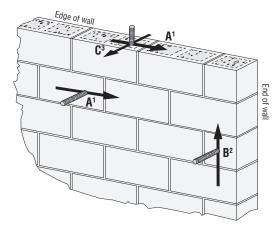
B. Allowable Anchor Locations of 7/6"-Diameter Threaded Rod and #4 and #5 Rebar for Full and Reduced Load Capacity When Installation Is in the Top of Fully Grouted CMU Masonry Wall Construction
